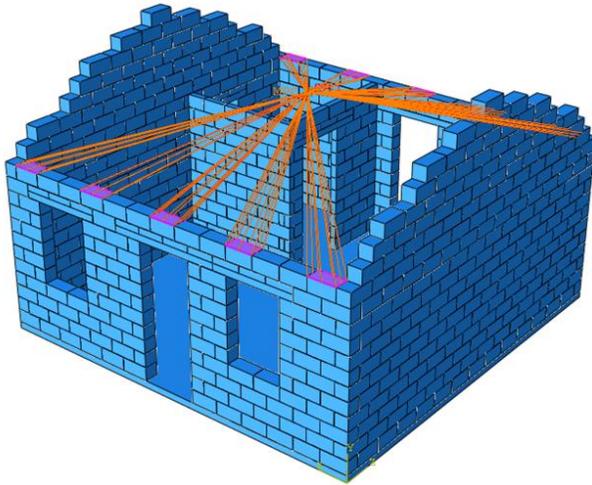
Rigid links connecting the lumped mass to the rest of the building
